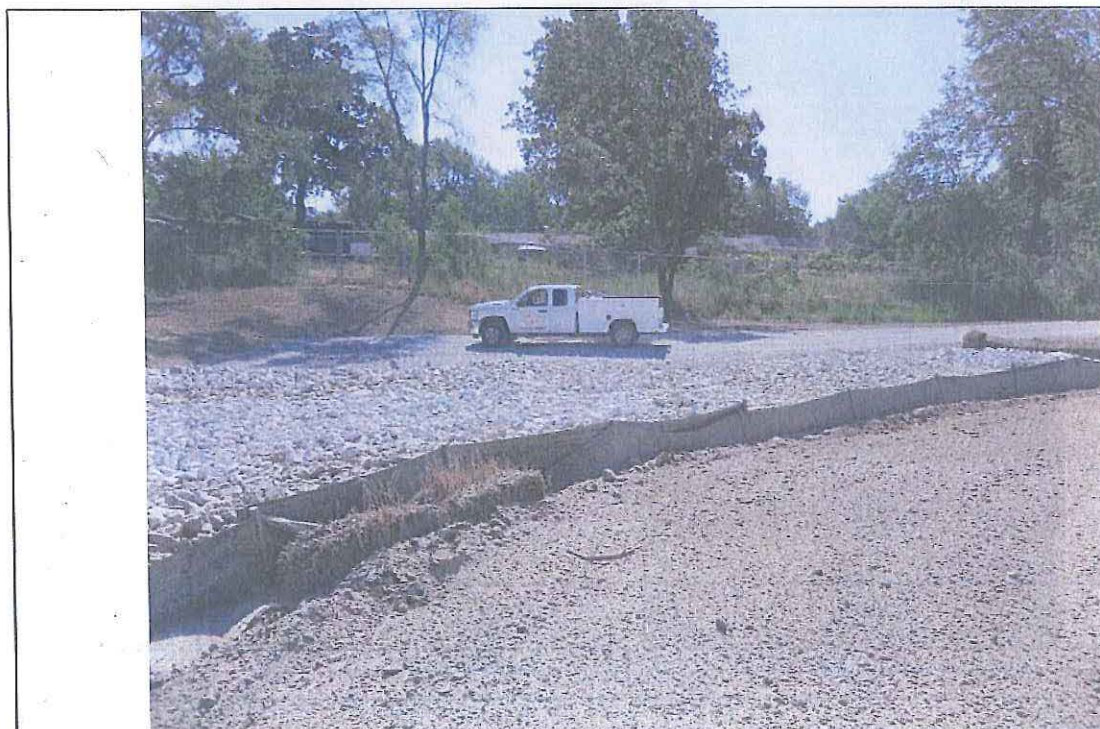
Southeast corner diversion berm rip rap re-shaped to prevent short flanking
